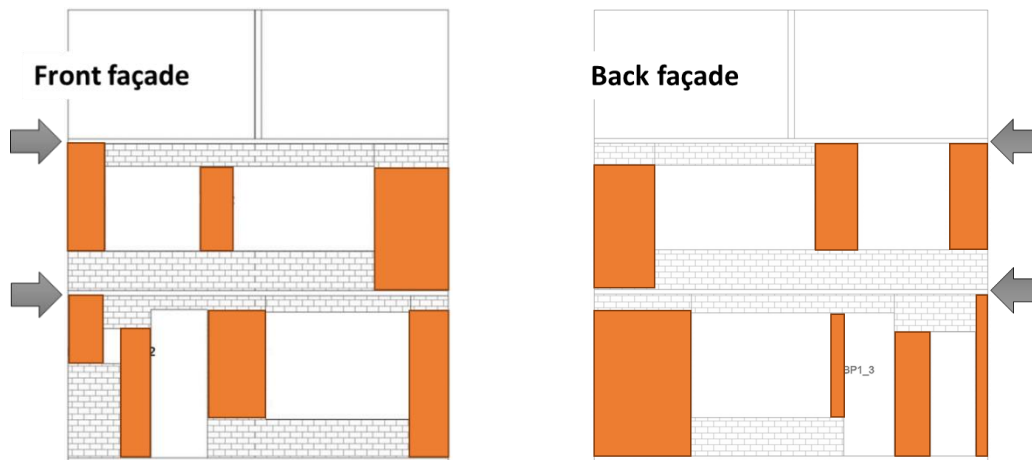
Piers defined on the front and back façades of Building D house for positive loading.
